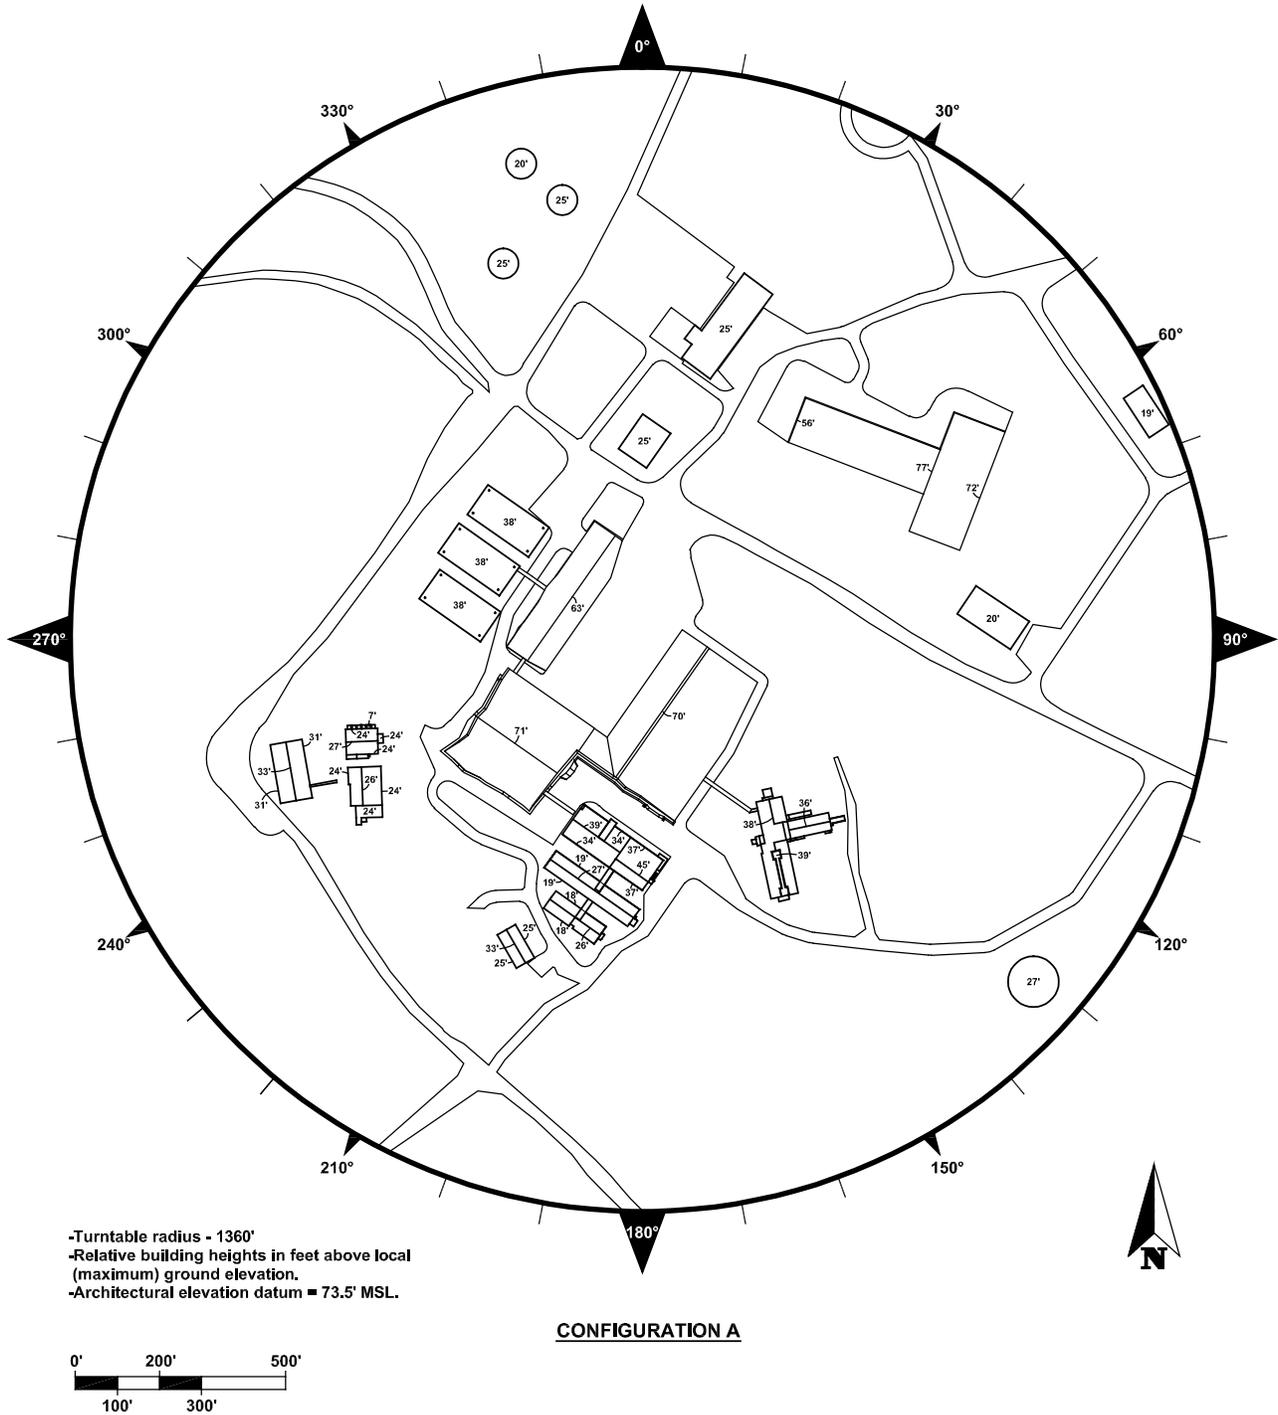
Site plan of the McMurdo Station with building heights: Model Configuration A
